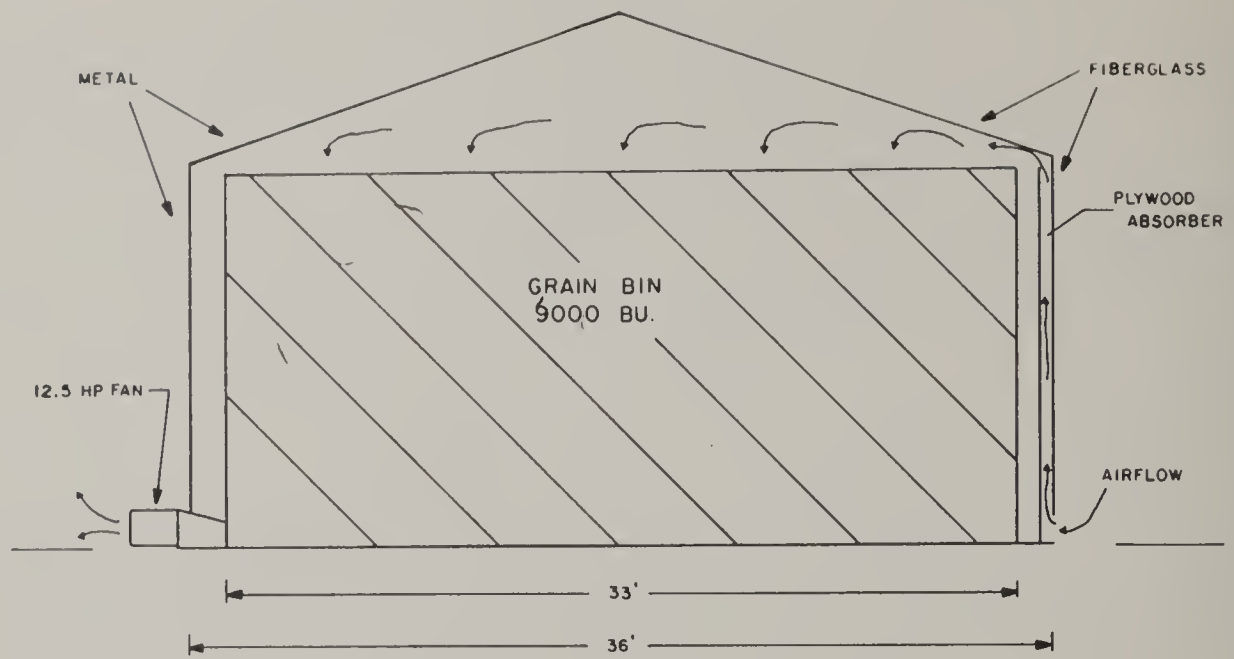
West cross section of drying bin in solar bin-in-building on the Steffen farm.
